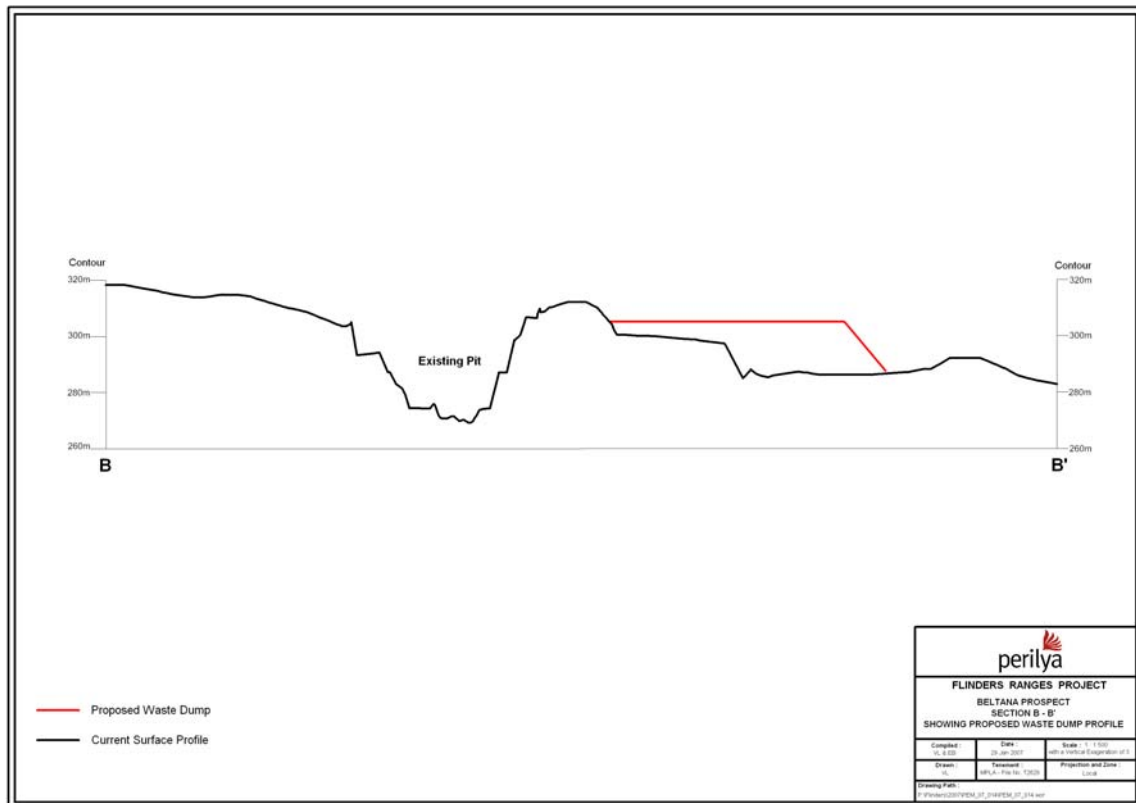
Proposed Waste Rock Dump Cross Section B-B'
